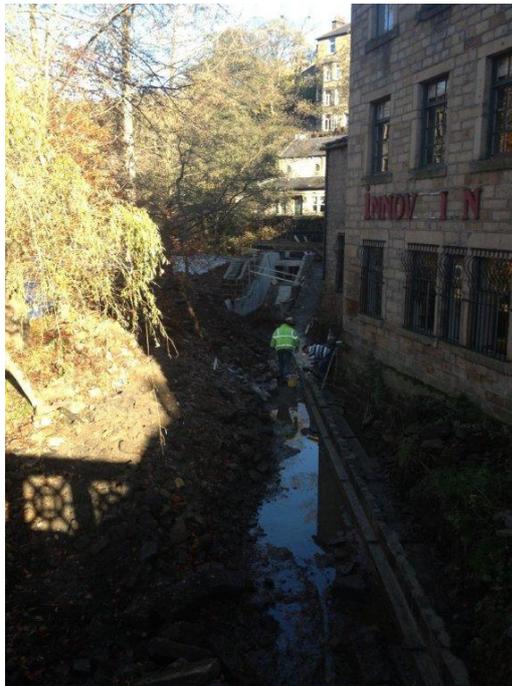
Installation of Archimedes screw at Bridge mill, Hebden Bridge
